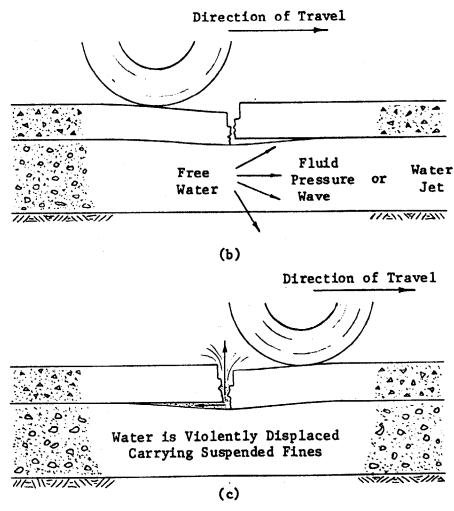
Action of Free Water in A.C. Pavement Structural Sections Under Dynamic Loading (16)
